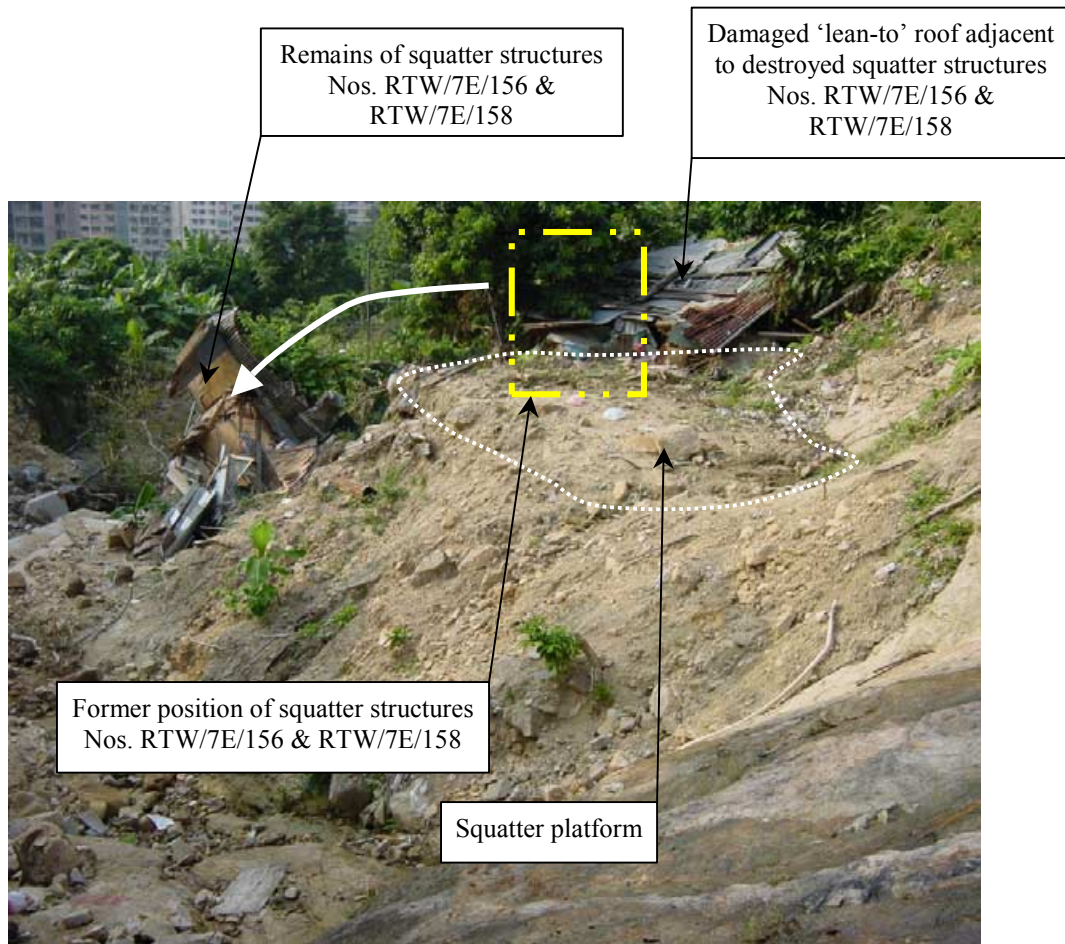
View Looking West towards Squatter Platform and Destroyed Squatter Structures Nos. RTW/7E/156 and RTW/7E/158
